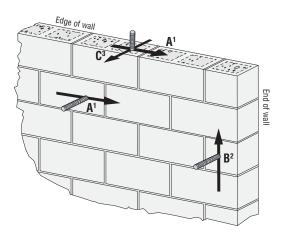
B. Allowable Anchor Locations of 1/4"-Diameter Threaded Rod and #4 and #5 Rebar for Full and Reduced Load Capacity When Installation Is in the Top of Fully Grouted CMU Masonry Wall Construction
